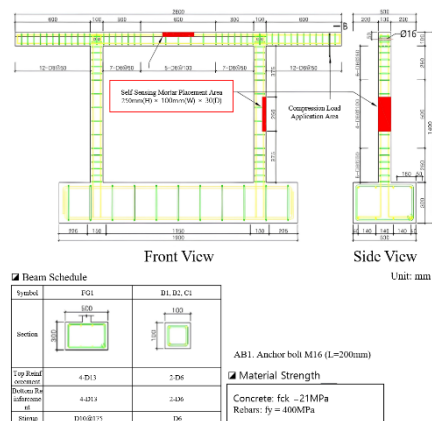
Reinforced Concrete Structural Unit Member Drawings
